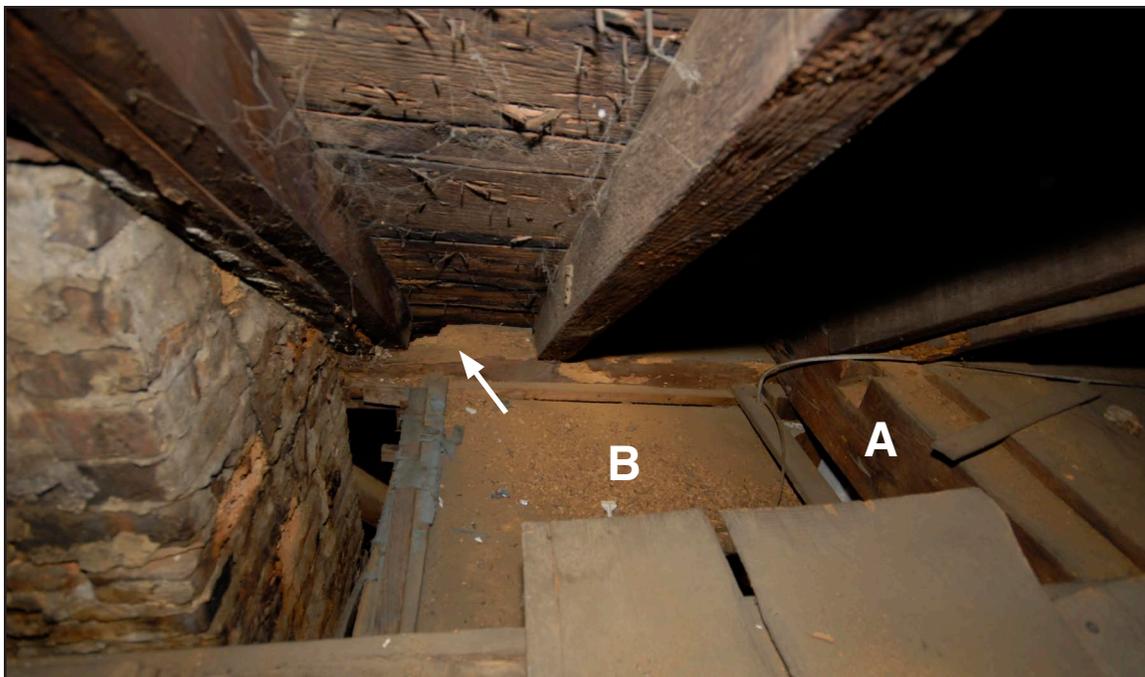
Leanto roof plate at north side of main attic showing rot and insect damage adjacent to the chimney (Arrow). "A" marks the north (rear) end of the attic chimney tie beam shown in photo 39 above. The base of the original rafter that sits on it has severe old insect damage and has reinforced with an added sister rafter. "B" marks the ceiling of closet 203A in the northeast chamber.
